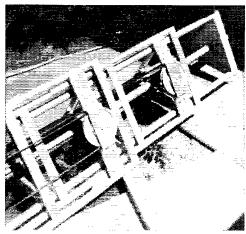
Pulleys for raising the tower are provided at the tops of the bottom and middle sections.
